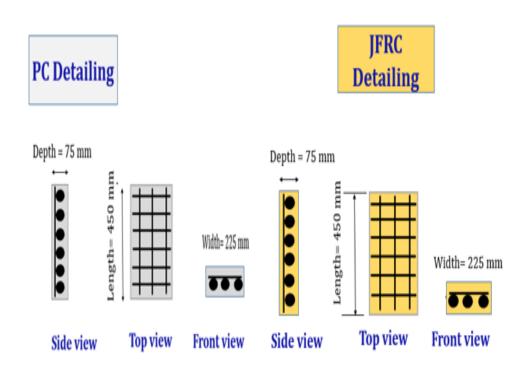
Typical details of PC and JFRC prototype slabs for impact testing.
